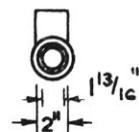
DETAIL OF PROPOSED PIPE INLET TRANSITION
